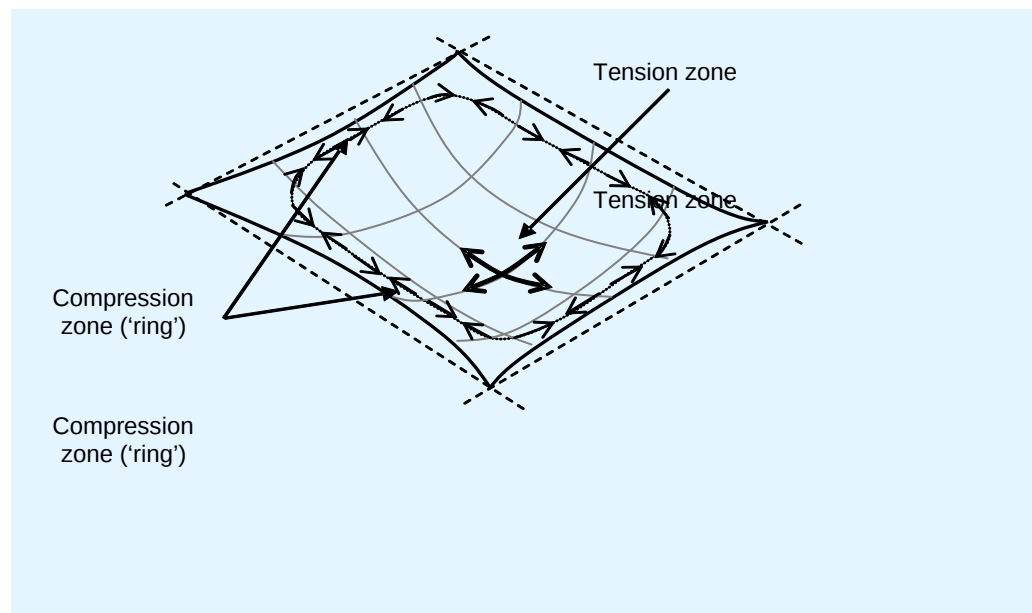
Membrane action in a horizontally restrained concrete slab
